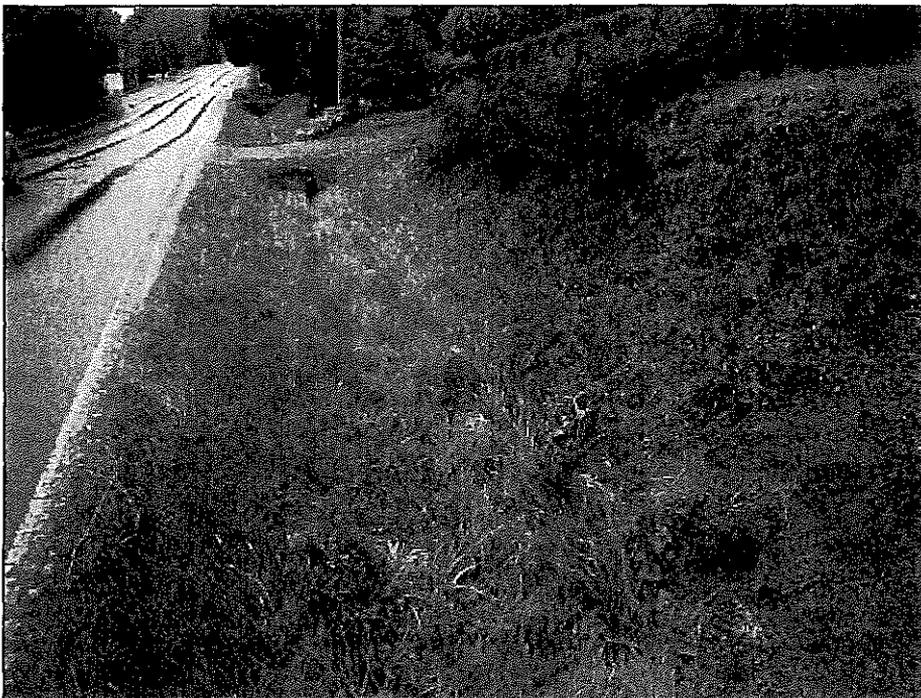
Looking downstream (west) along the vegetated ditch/swale that parallels Youbou Road. The subject drainage enters this ditch from the north, at the point where the photo was taken.
